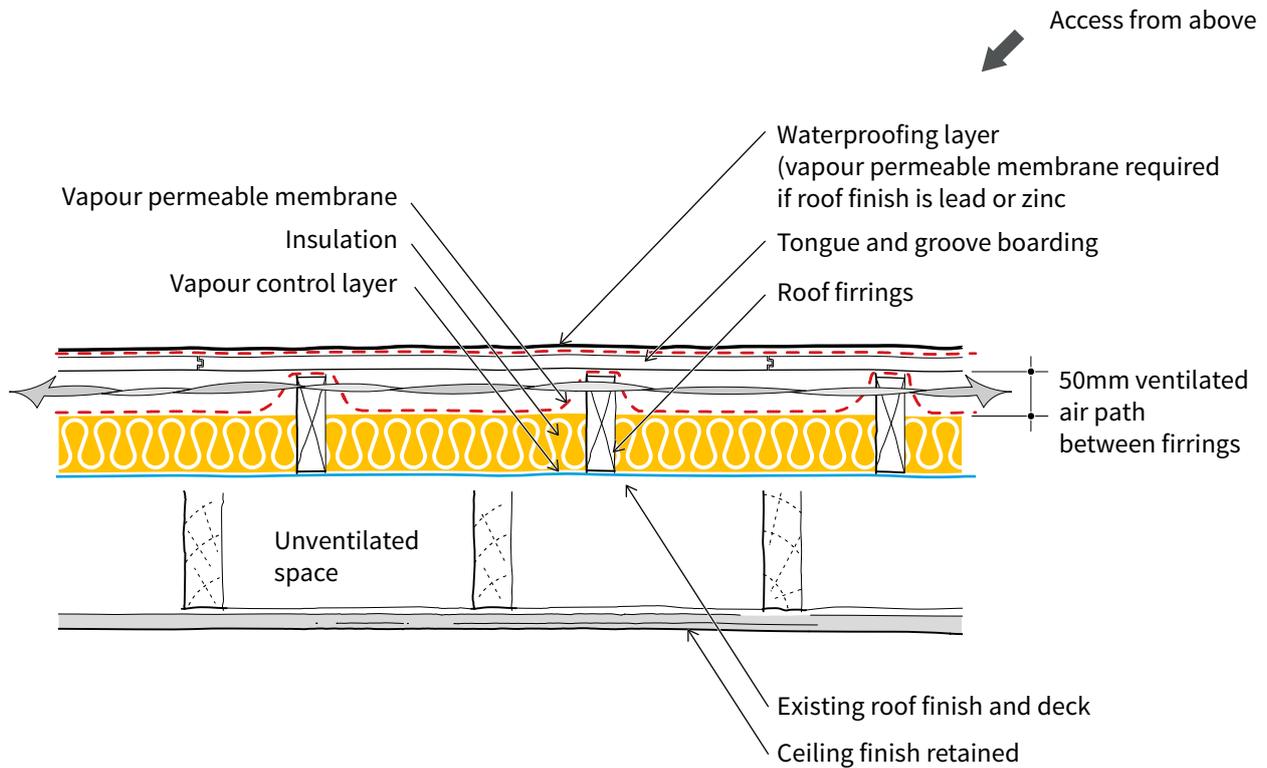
Ventilated warm roof (Insulation above existing roof finish)
